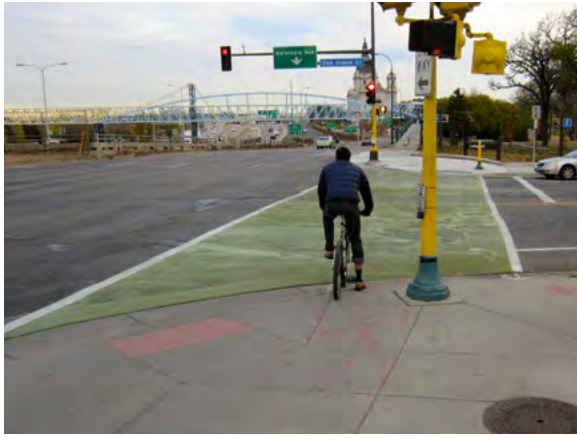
Oak Grove Street West intersection after installation with original colored crosswalk
